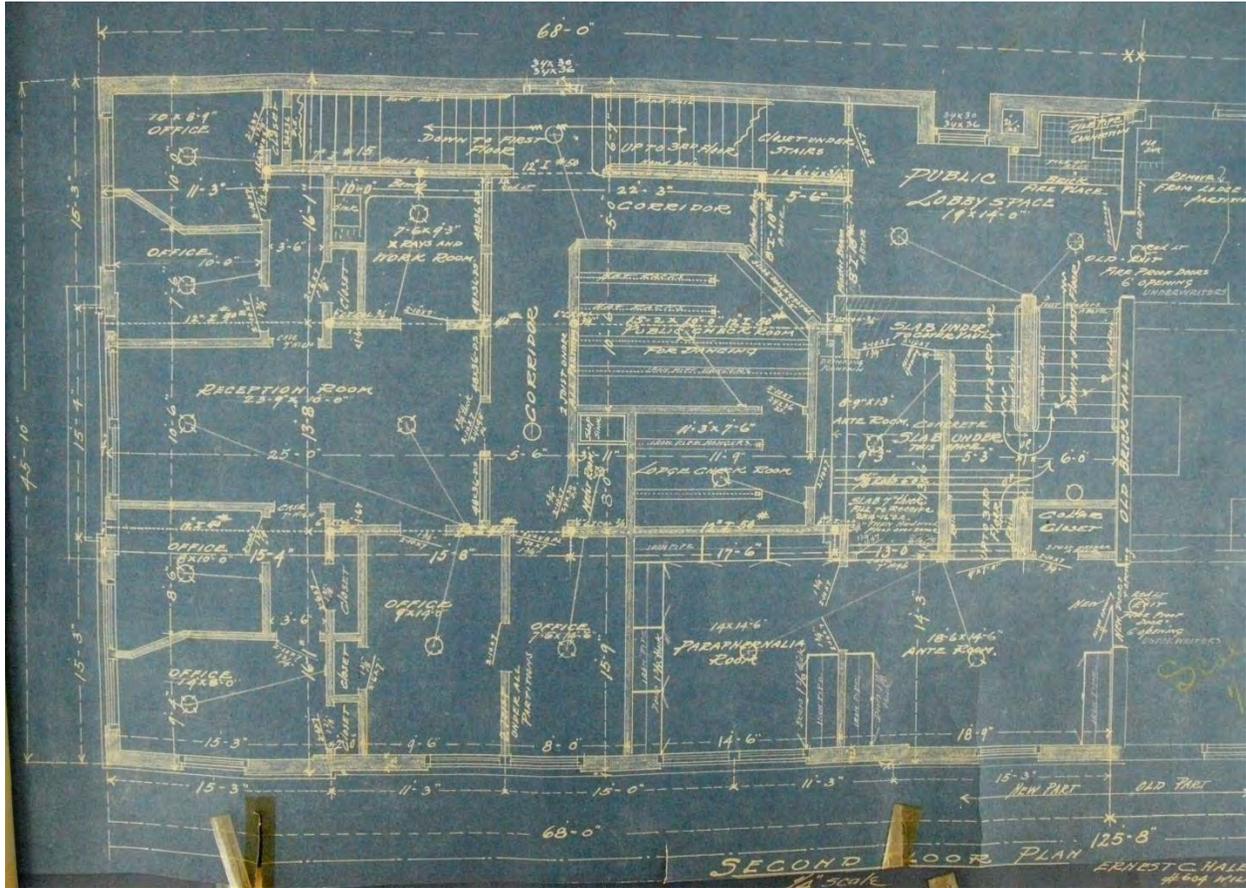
Second floor plan 1920 addition, source: Northwest Architectural Archives
